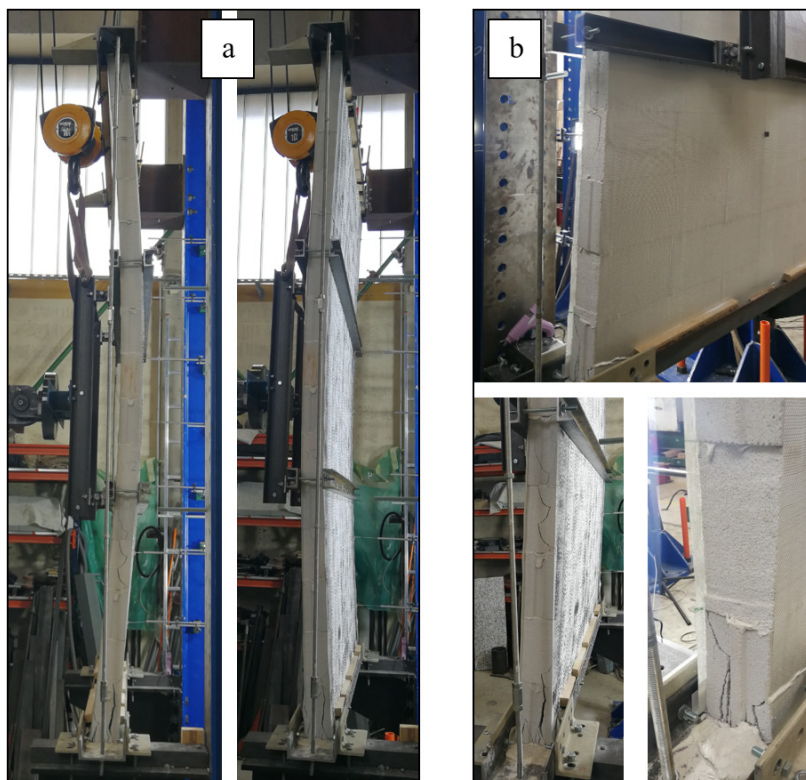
Testing of the non-structural wall specimen YT-1A: (a) Deformation shape, (b) specimen's damage occurred during quasi-static cyclic testing.
